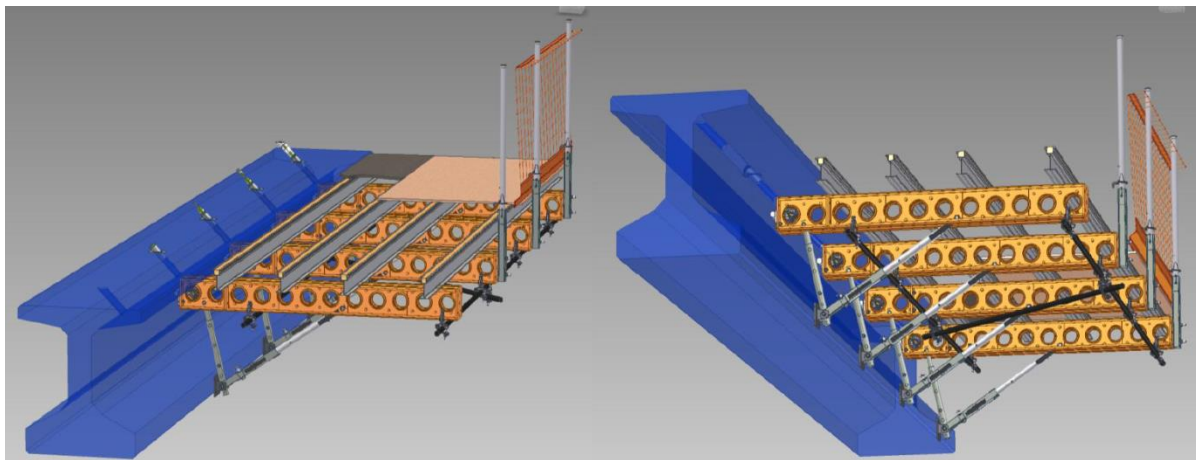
Paraslim system attached to a concrete girder (RMD Kwikform, 2013)
